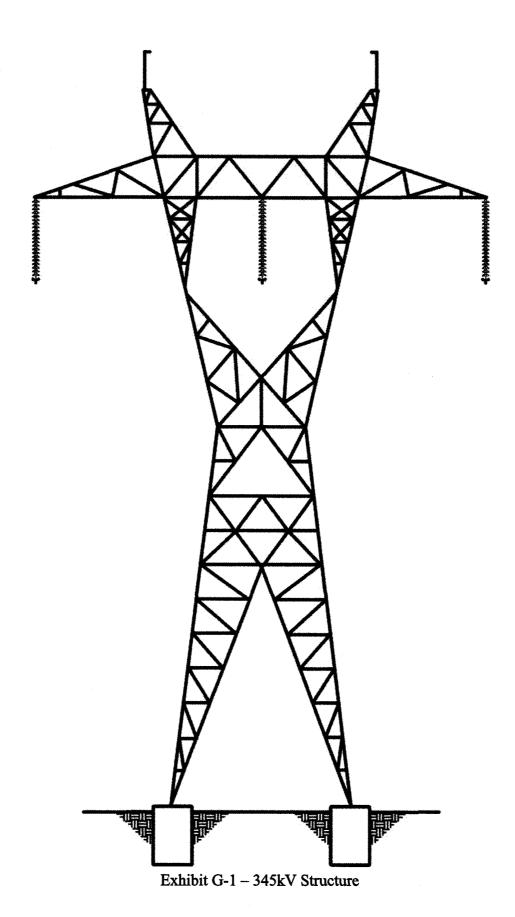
## EXHIBIT G: CONCEPTS OF PROPOSED FACILITIES
